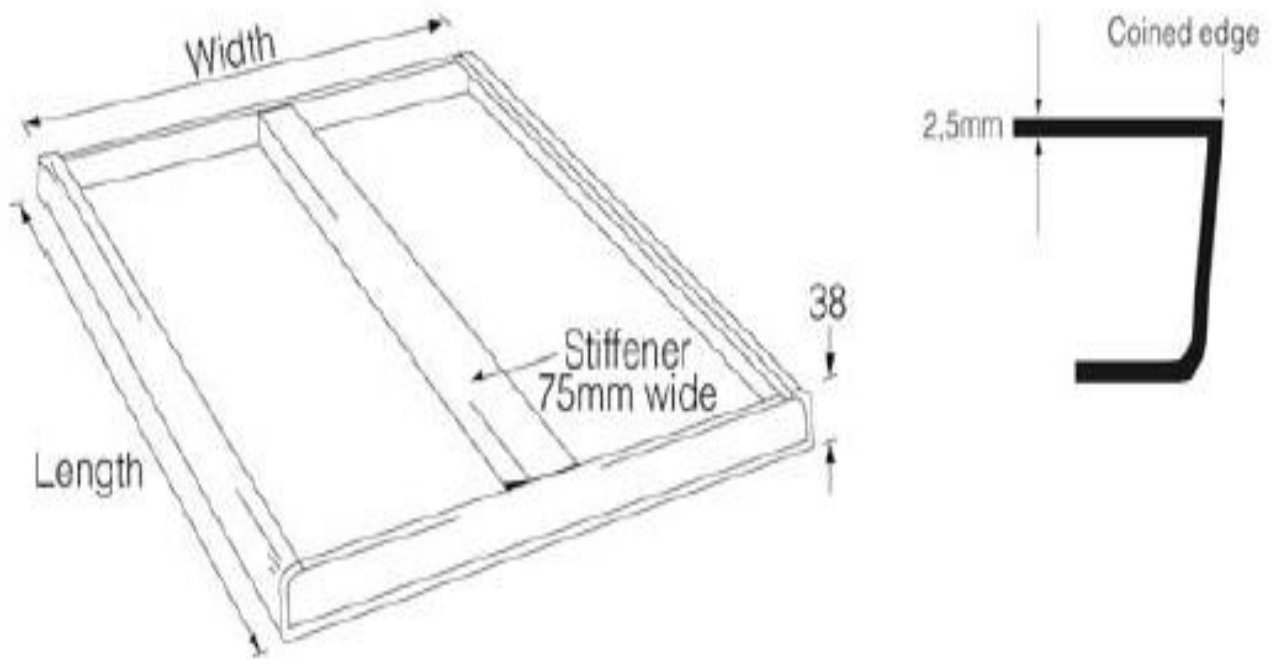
Typical Formwork for Mass Production of Deck Panels
